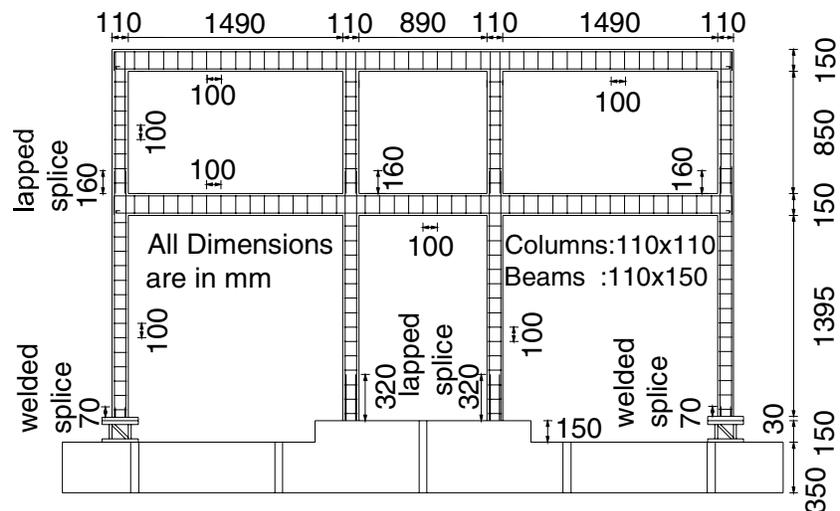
Dimensions and Reinforcement Details of the Frame (Dimensions are in mm)
